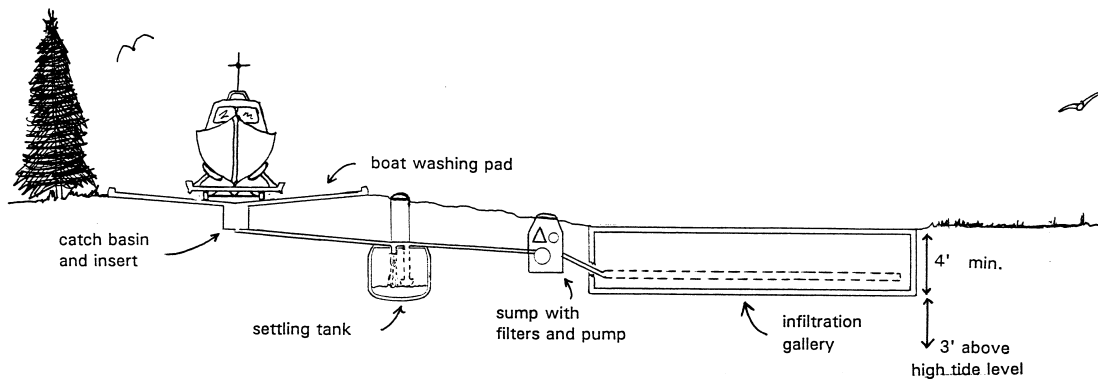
CROSS SECTION OF BOAT WASHING SYSTEM
